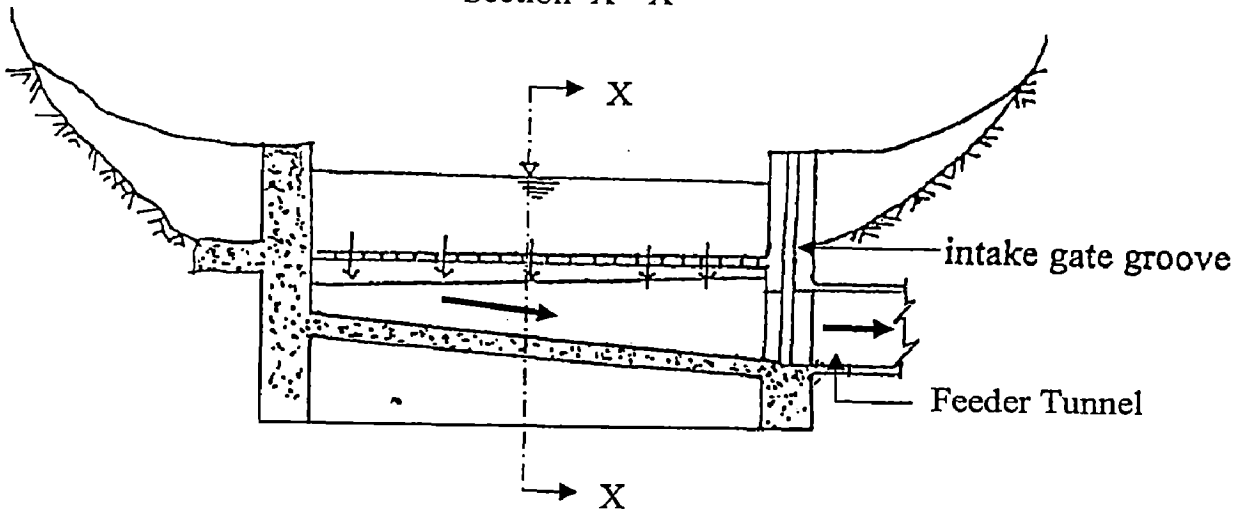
TYPES OF BOTTOM INTAKE TRENCH WEIR
